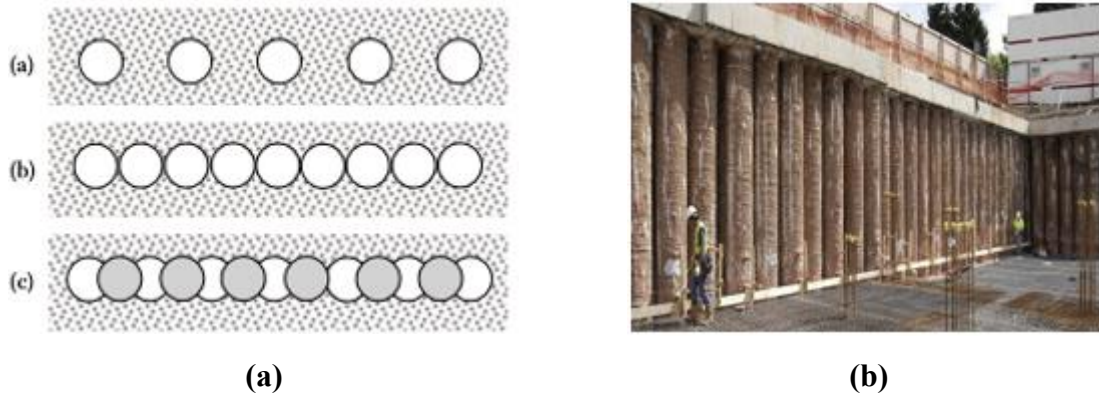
Bored pile walls (A) Plan view through typical bored pile wall configurations: (a) intermittent, (b) contiguous, (c) secant. (Clayton et al., 2020) (B) Typical bored pile walls (theconstructor.org)
